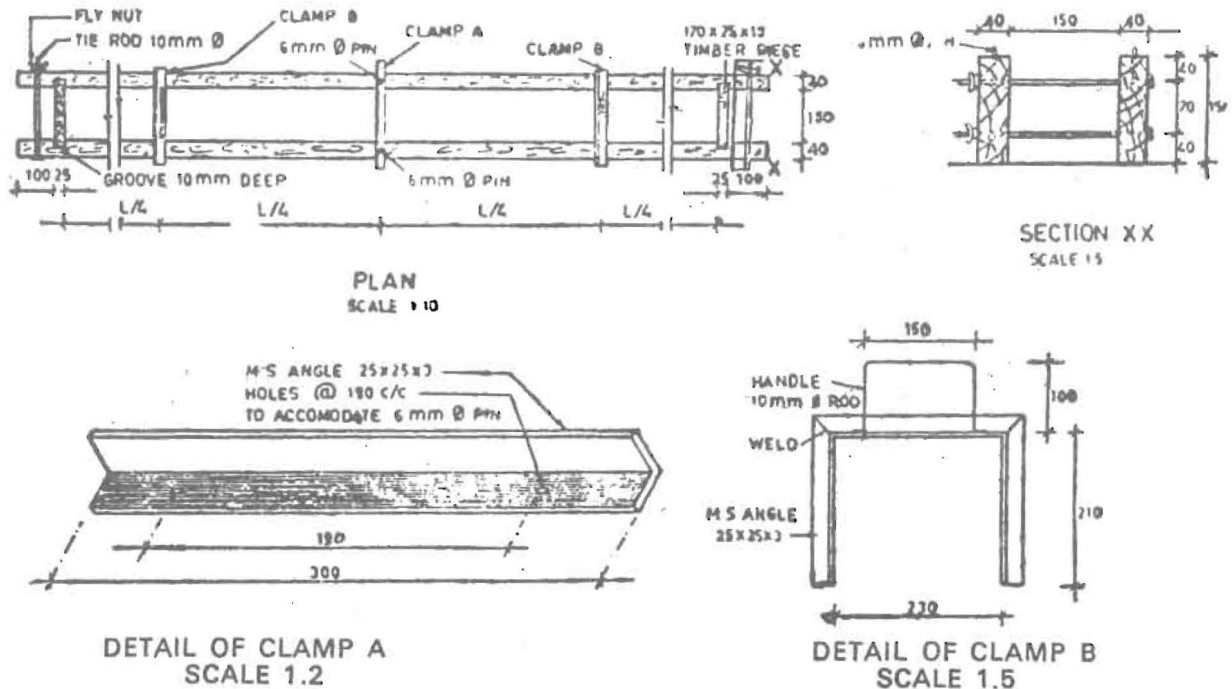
A : TIMBER MOULD FOR PARTIALLY PRECAST JOIST
